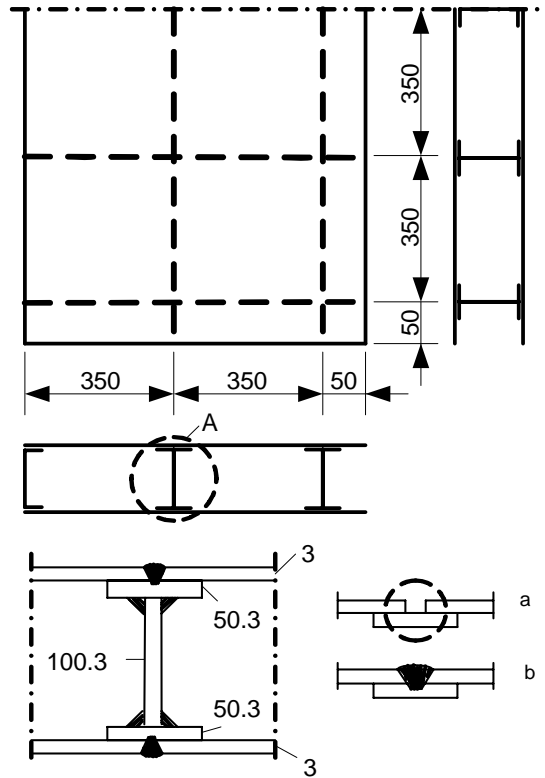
Dimensions of the welded steel cellular plate model
